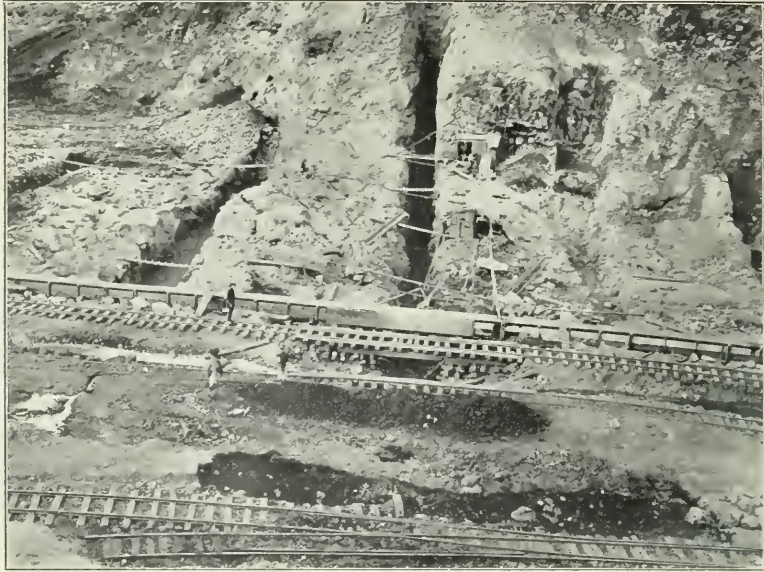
EXCAVATION FOR CUT-OFF CORE-WALL AND LATERAL TRENCHES, DAM NO. 2, NECAXA.
